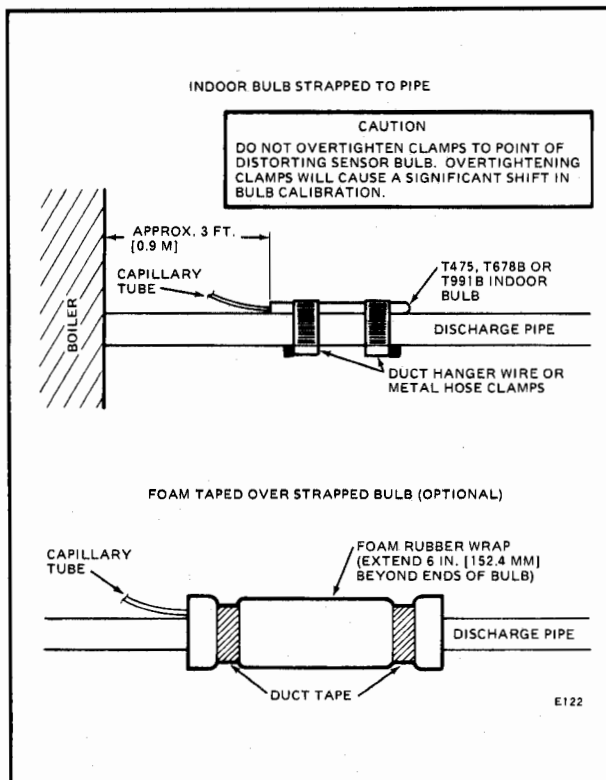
Wrap-on mounting of T475A, T678B, or T991B indoor bulb on a boiler discharge pipe.
